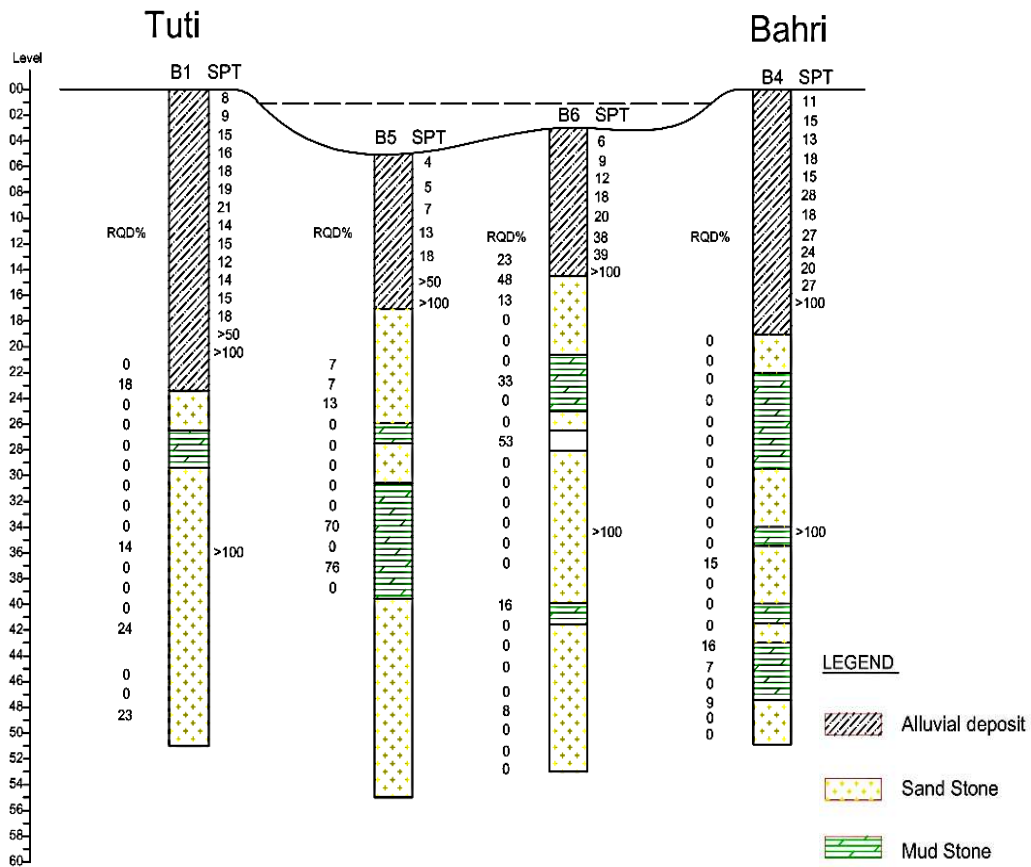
Subsurface profile of Tuti-Bahri bridge site
